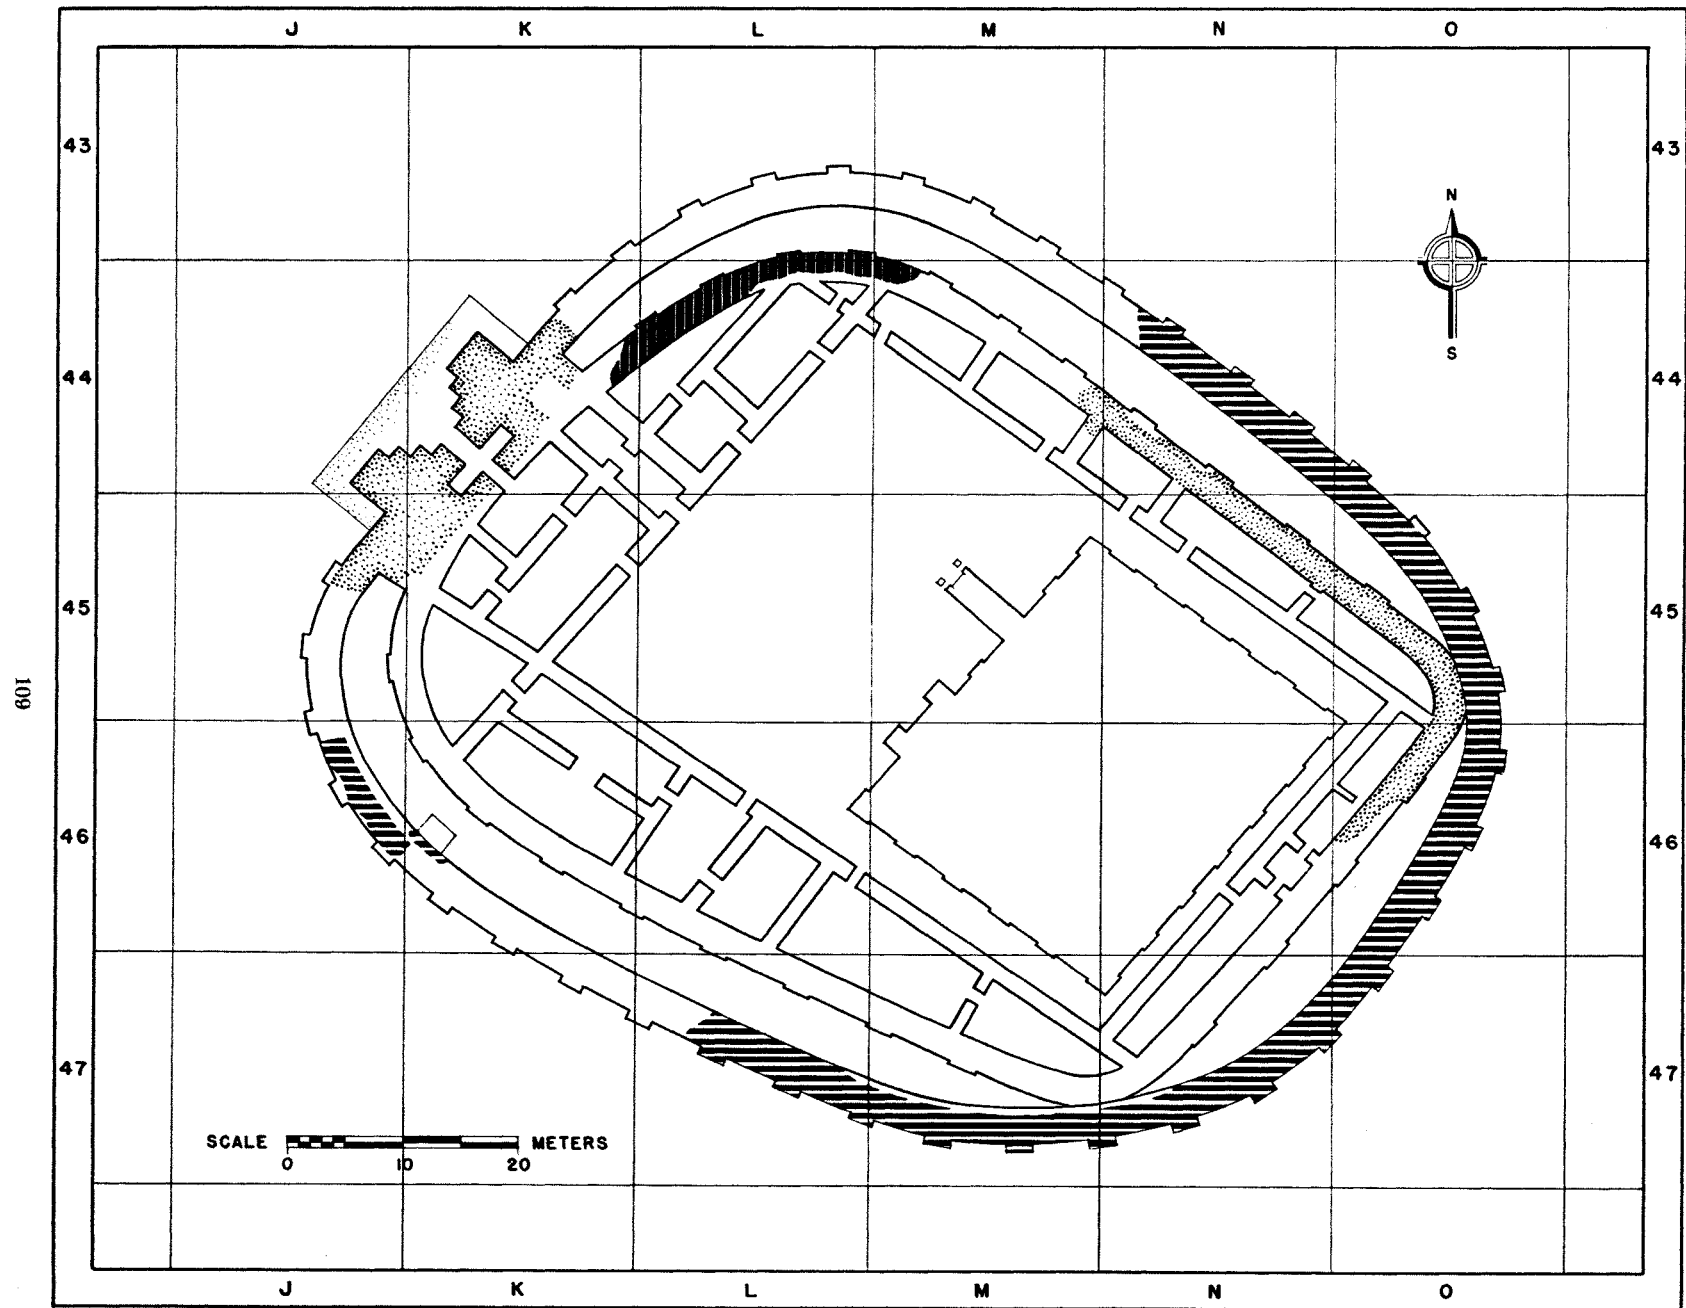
CONJECTURAL RESTORATION OF THE TEMPLE OVAL OF THE THIRD BUILDING PERIOD, COMBINING THE STRAIGHTENED INNER INCLOSURE WALL WITH THE BUTTRESSED SECTION ADJOINING "HOUSE D," THE BUTTRESSED OUTER INCLOSURE WALL, AND THE LATE GATEWAY. SCALE, 1:640
